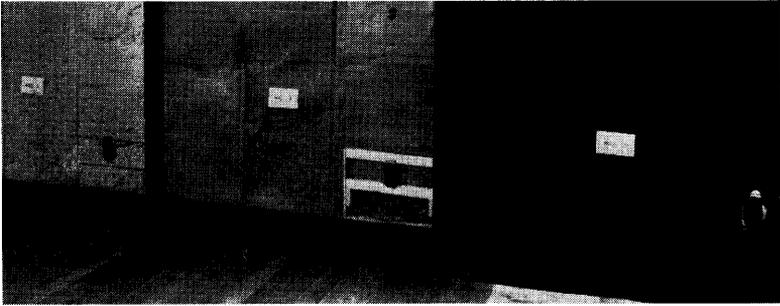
VIEW OF INTERIOR SURFACES OF WALLS A, B, AND C BEFORE LATH AND PLASTER WERE APPLIED SHOWING INSULATION, DIFFERENT TYPES OF BARRIERS, INSTALLATION OF ELECTRICAL OUTLETS, AND BARRIER SEAL AROUND OUTLETS.
